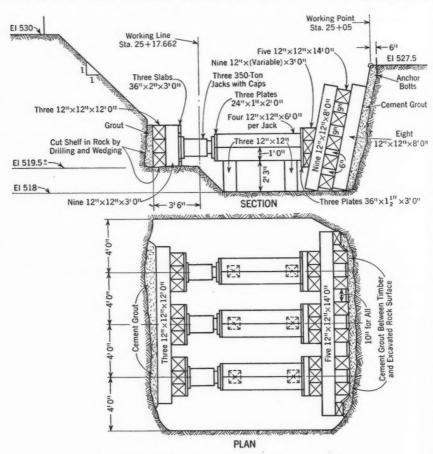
Jacking Test, North Anchorage, Canadian Side
